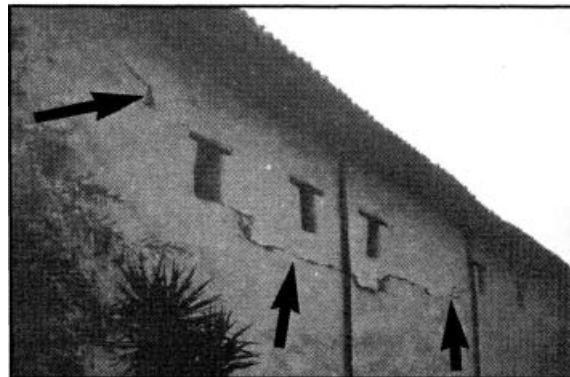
Horizontal cracking in the upper section of the adobe wall. This crack extends approximately two-thirds of the length of the building. Out-of-plane rocking is indicated by this crack and the crack on the opposite side of the building (Figure 12.2).
